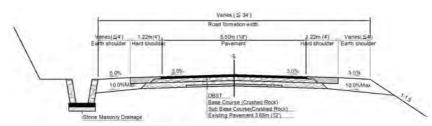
Typical Cross Section in Mountain Region (MOC-22 / Bituminous Road (DBST) Overlaying: 5.5m)
